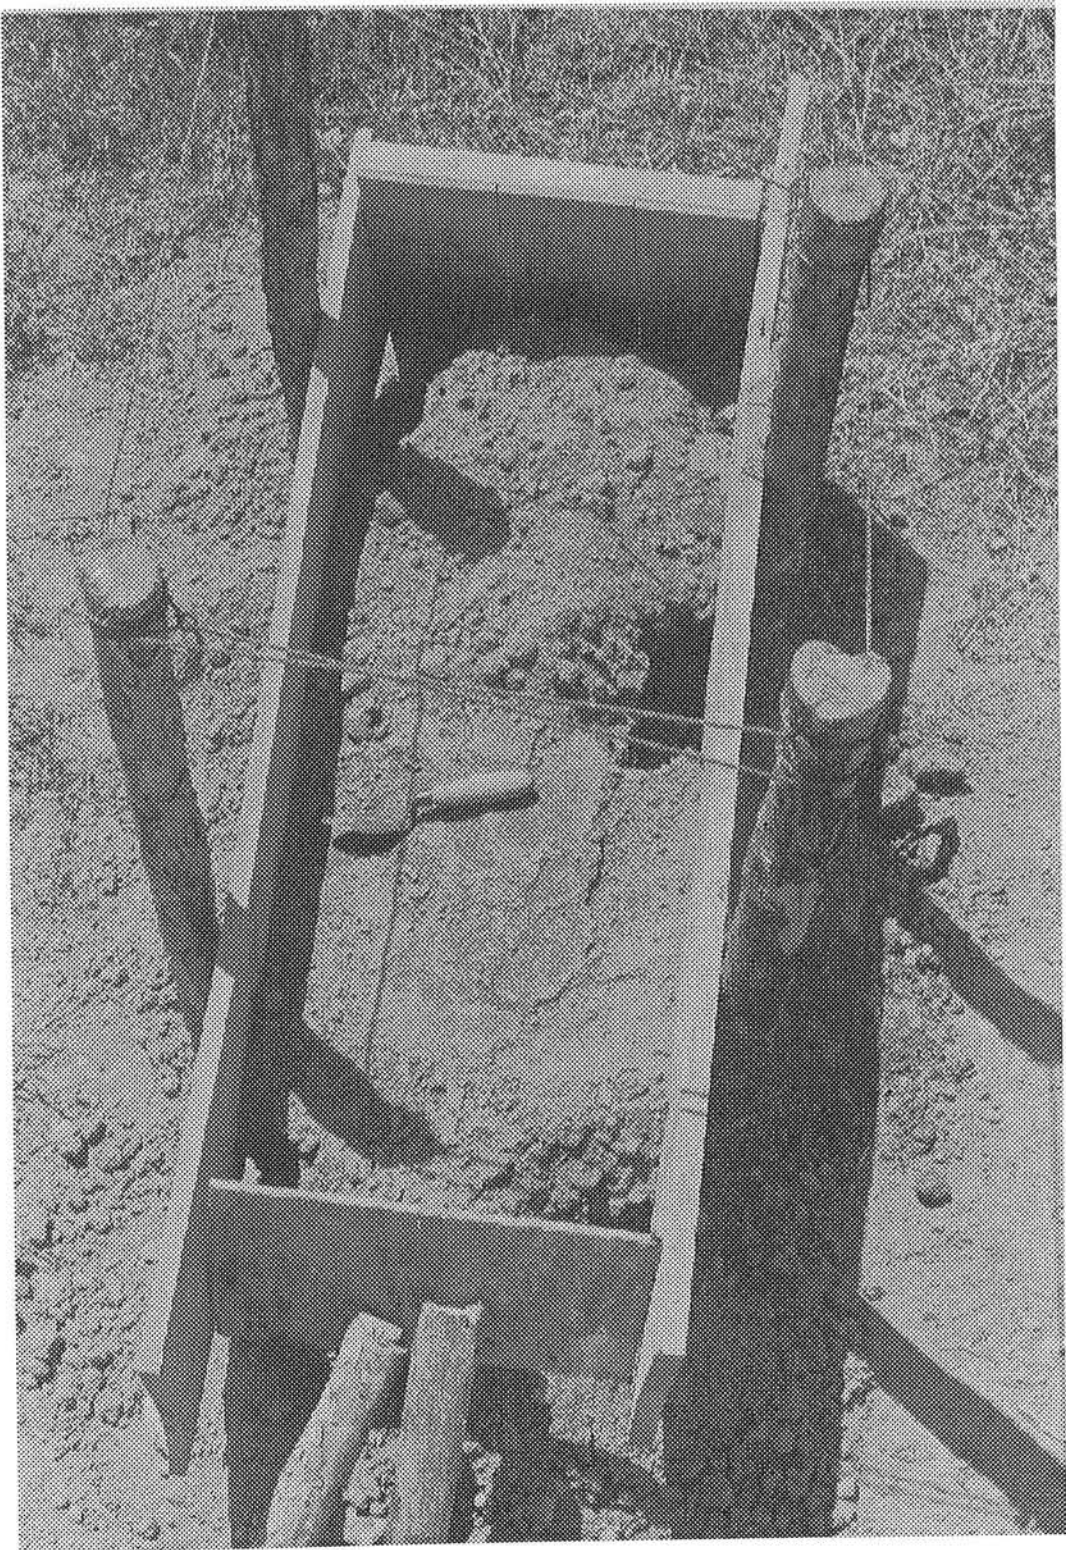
LEV, experiment E17 showing failure during construction.
